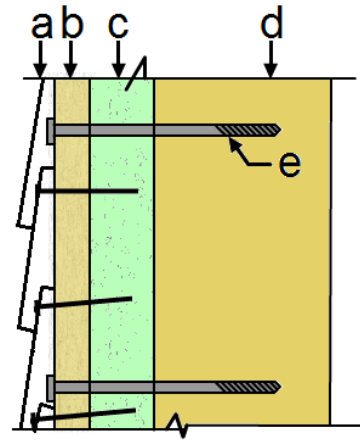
Exterior Wall Covering Assembly with Cladding & Furring Installed Over GreenGuard® Insulation Board
